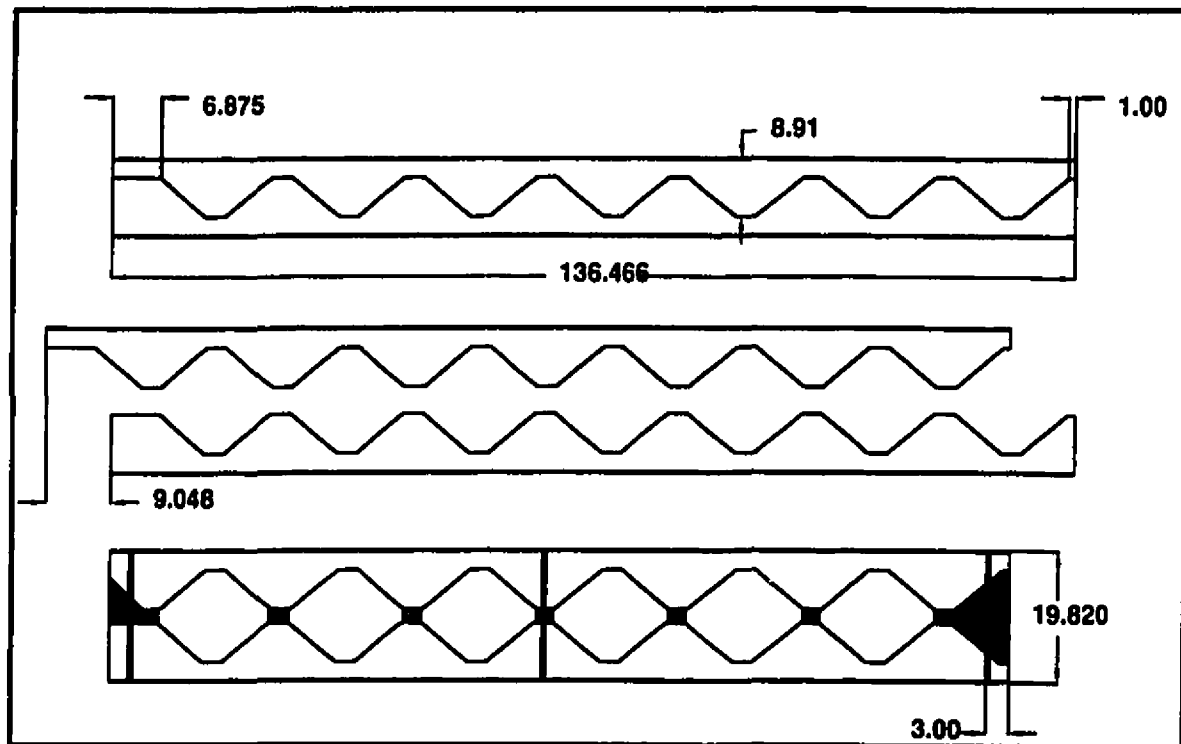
Cut and Weld Pattern (Specimen 12-4)
